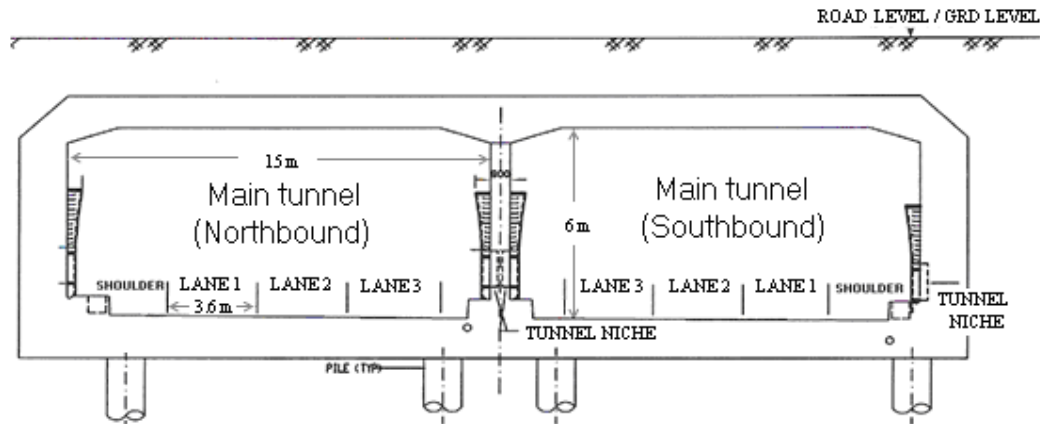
Cross section of the tunnel showing the tunnel dividing wall
